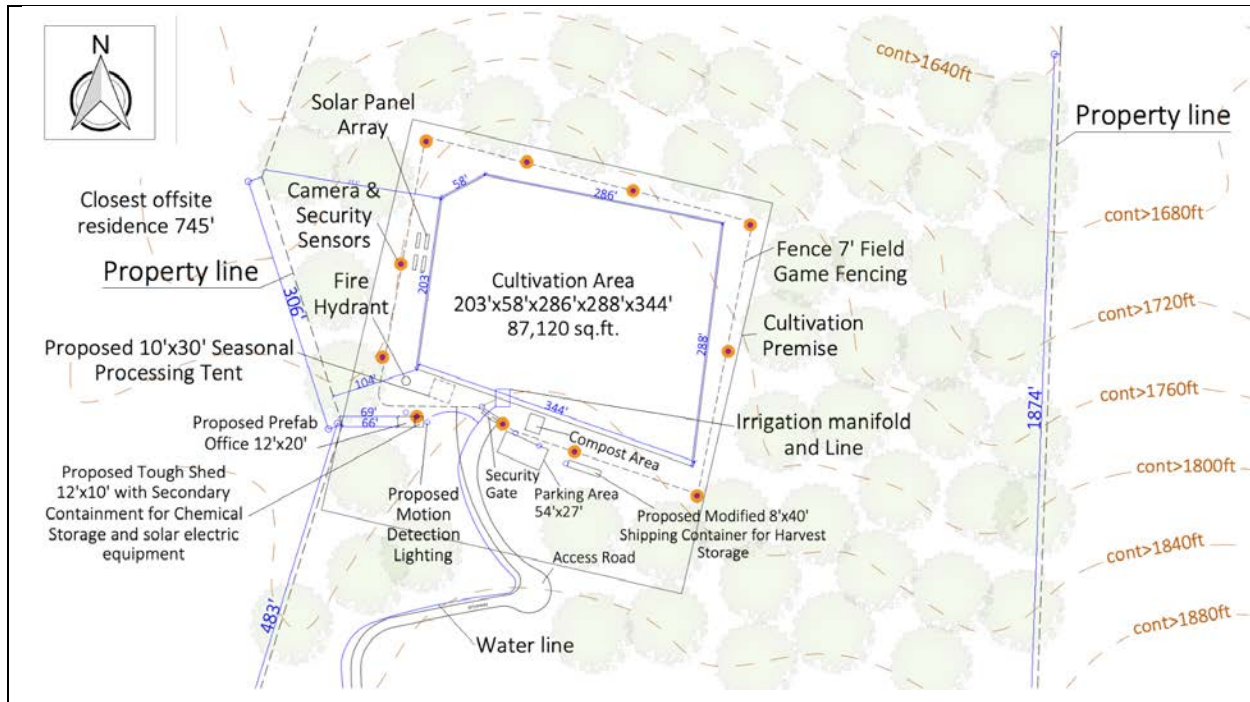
B. PREMISE SITE PLAN DETAILS, 87,120 SF CULTIVATION AREA
